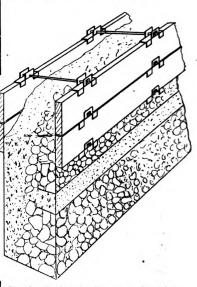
Holders in Use on a Straight Wall with Cobblestone Facing.
